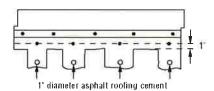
Fastening Presidential and Presidential T/L Sbake shingles on steep slopes.
